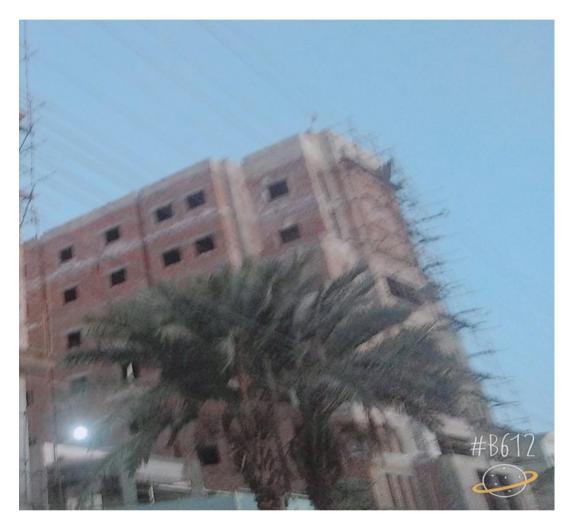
Hotel Multi story building under construction at cornor of tariq road and old bwp road Multan
